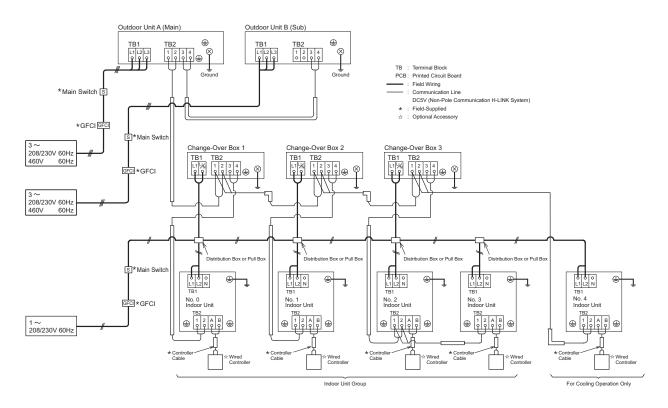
Instruction for Electrical Wiring Connection (Heat Recovery System)
